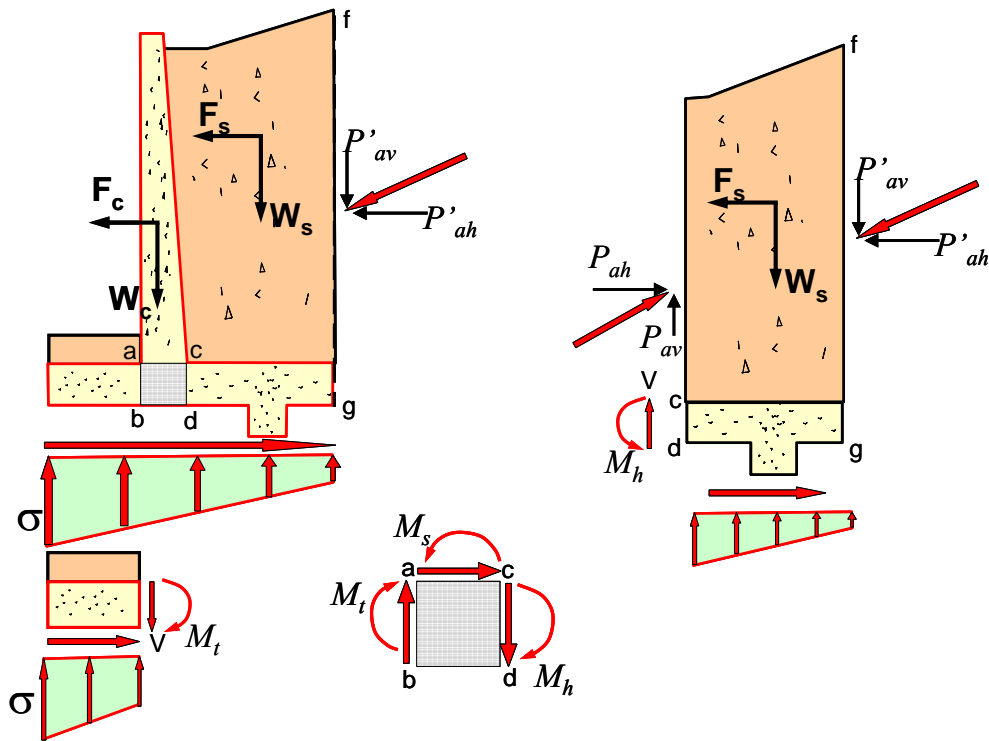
Forces Acting at the Critical Sections of the Wall
